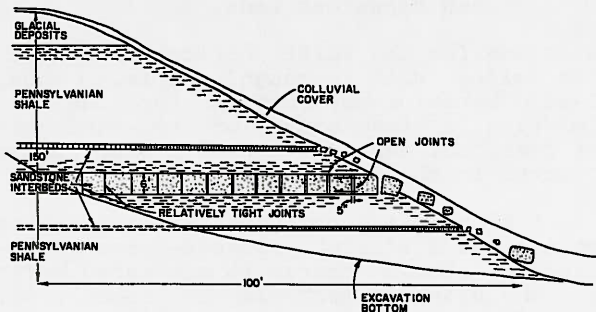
Diagram showing downstream wall of abutment key for earth embankment in north-central Illinois.
